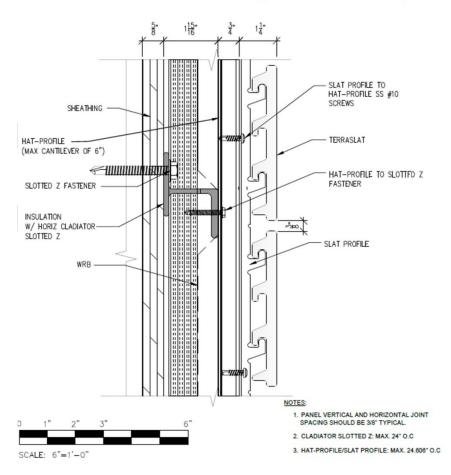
Horizontal TerrSlat Attachment Wall Details
